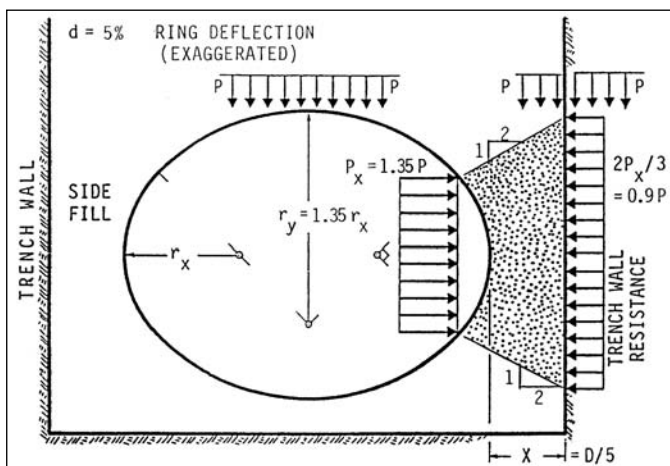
Trench wall support required for flexible ring stability, showing the sidefill wedge at soil slip. In this case, ring deflection is $d = 5\%$ and width of sidefill is $X = D/5$. In this worst-case example, and in general, the required trench wall resistance is less than pressure P on the pipe.
